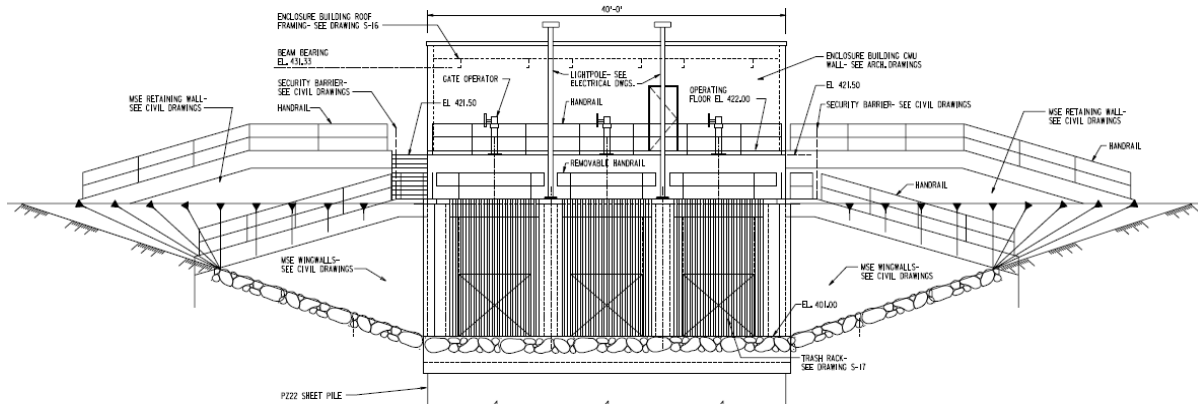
Chain of Rocks Pump Station – East Elevation
